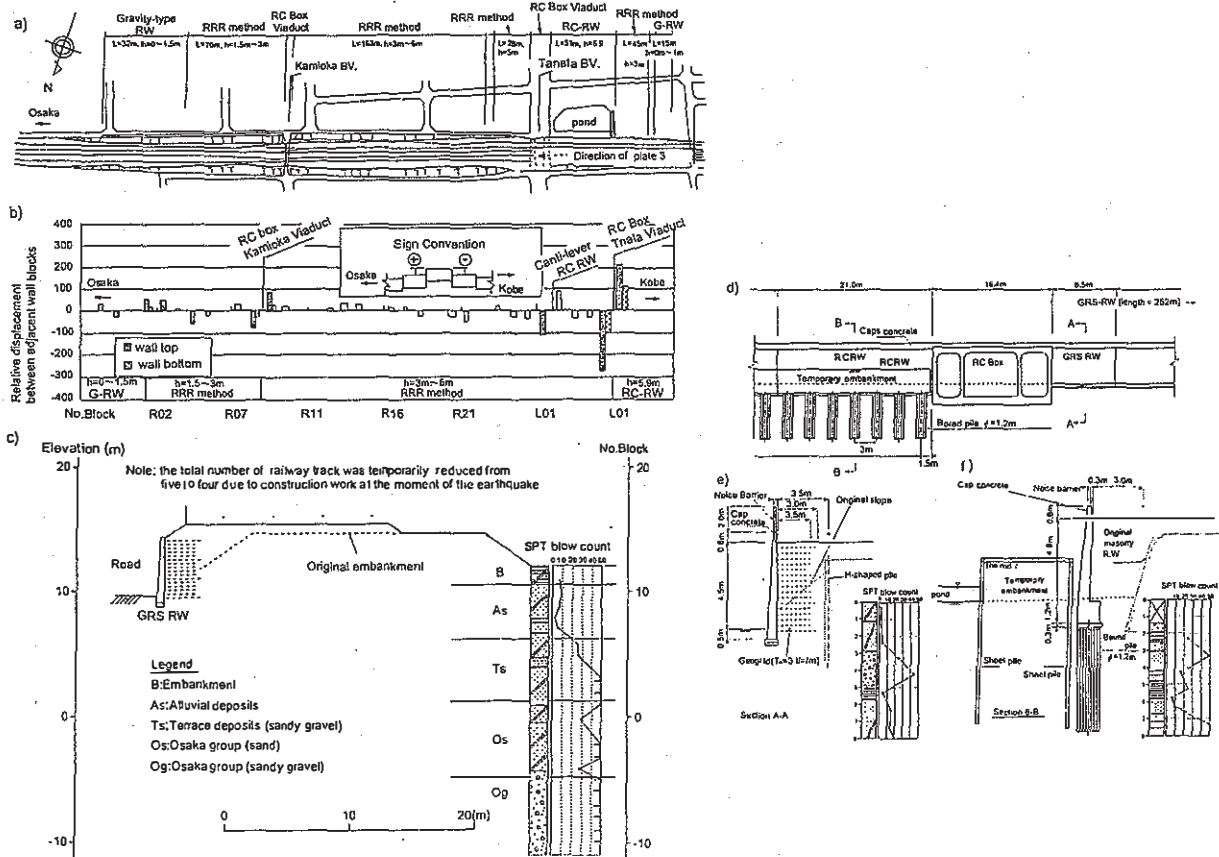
a) plan of the site, b) relative displacement between adjacent facing sections of RRR method and cantilever RC RW, c) cross-section of embankment, d) front view from south of GRS-RW and cantilever RC RW, e) typical cross-section of RRR method, and f) typical cross-section of RC RW at Tanata
